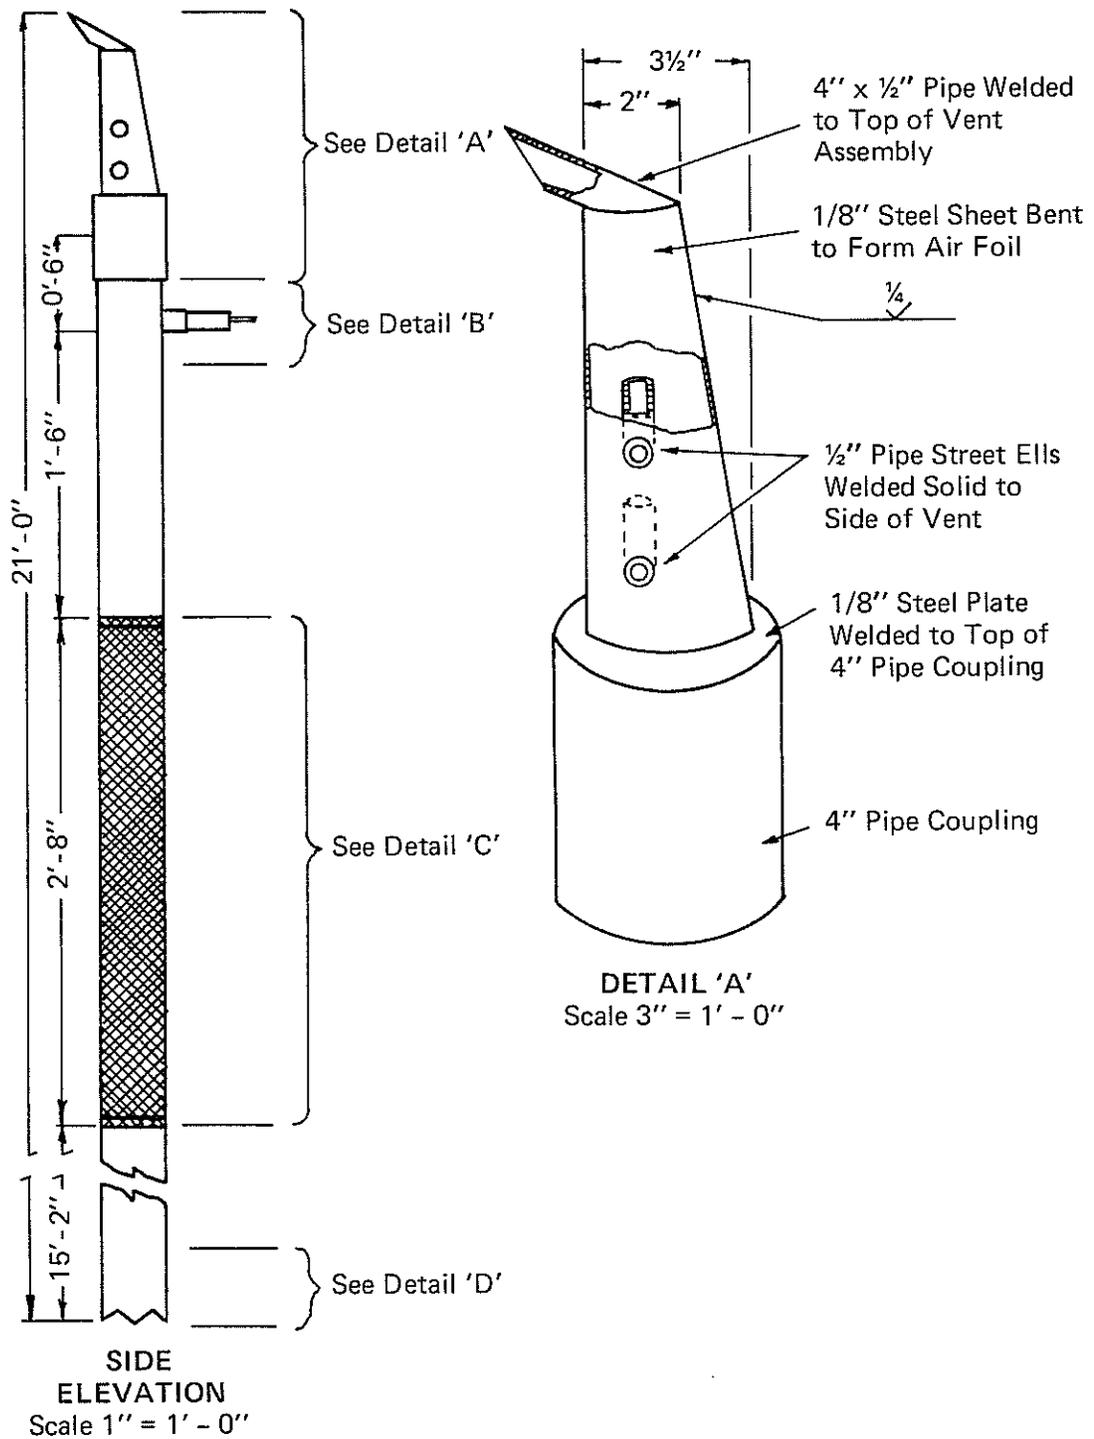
Giant sand point with built-in silt trap and vent: *Left* (page 140), details C, B, and D; *Above*, detail A.
